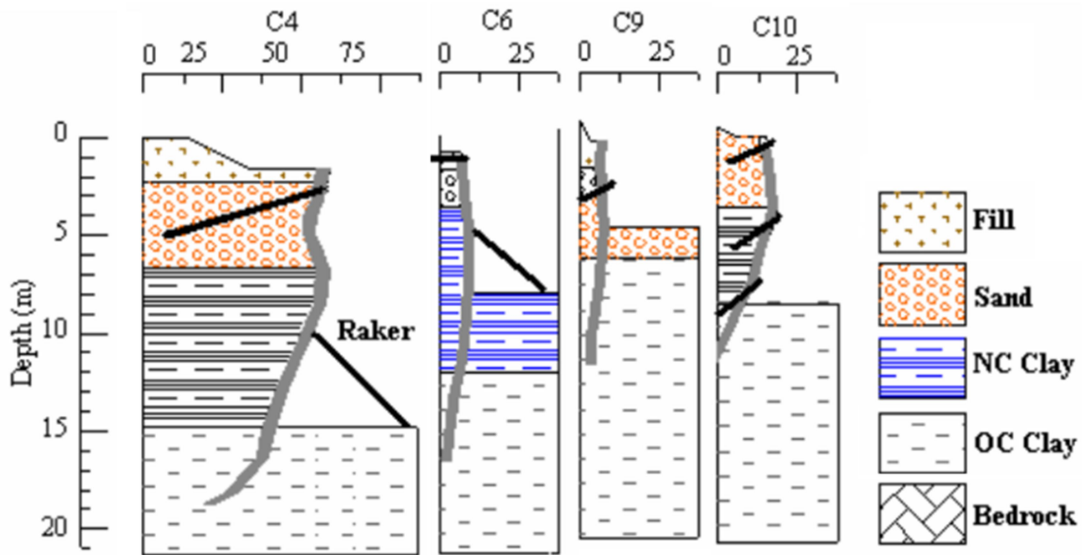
Typical Section and Wall Deformations of Floating Excavations with Soil Anchors and Inclined Rakers (Konstantakos 2008 [17])
